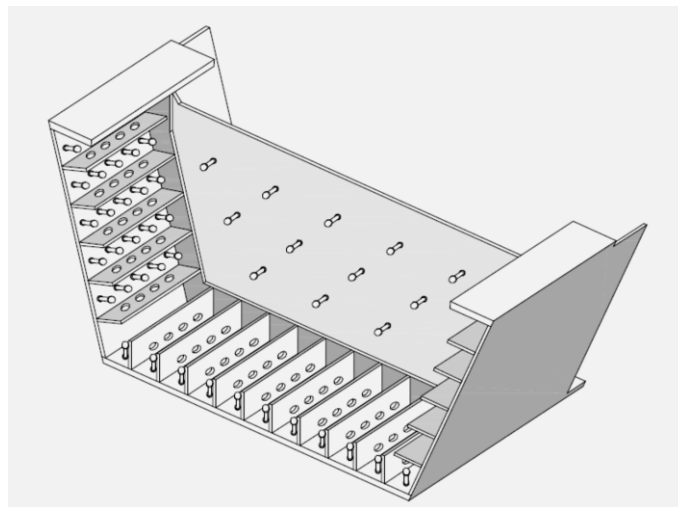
Connection element between the steel and concrete parts (Armando Rito, 2012)
